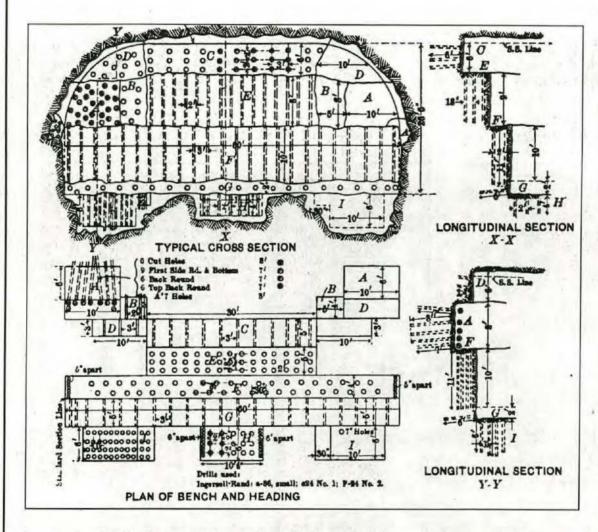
North River Tunnel - Details of Method of Drilling and Blasting and Plan for Bench Heading (New York Tunnel Extension: Description of the Work and Facilities, Vol. I, p. 183.)
